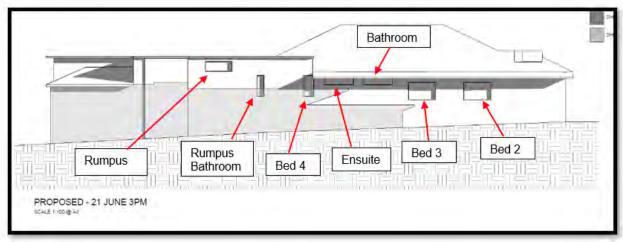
Elevational plan detailing overshadowing to No. 38 Olive Street at 3pm on June 21.
